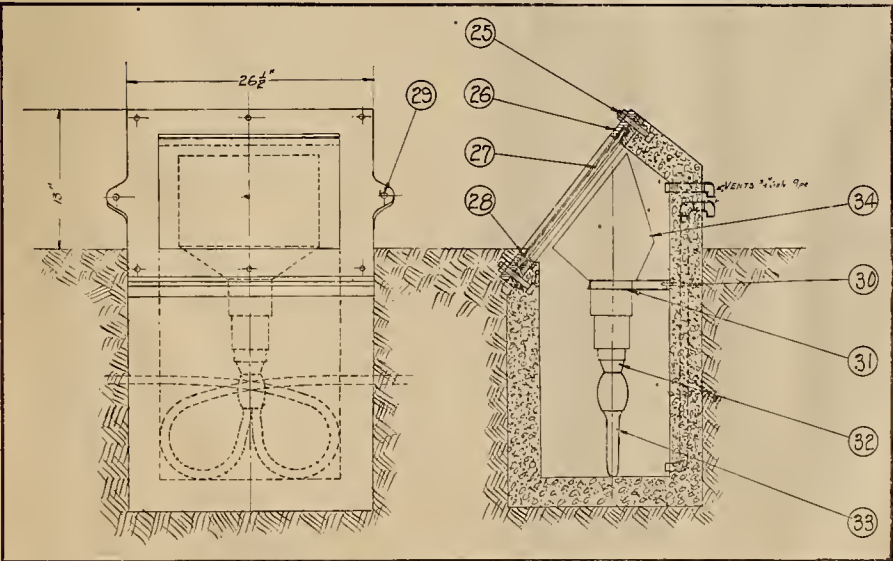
Detail of one of the floodlights used to illuminate some of the groups of trees and shrubs. This is installed in a watertight concrete container. Legend: 25, bolts; 26, frame; 27, glass; 28, gasket; 29, padlock; 30, bolt; 31, clamp; 32, ferrule; 33, cable; 34, floodlight.
